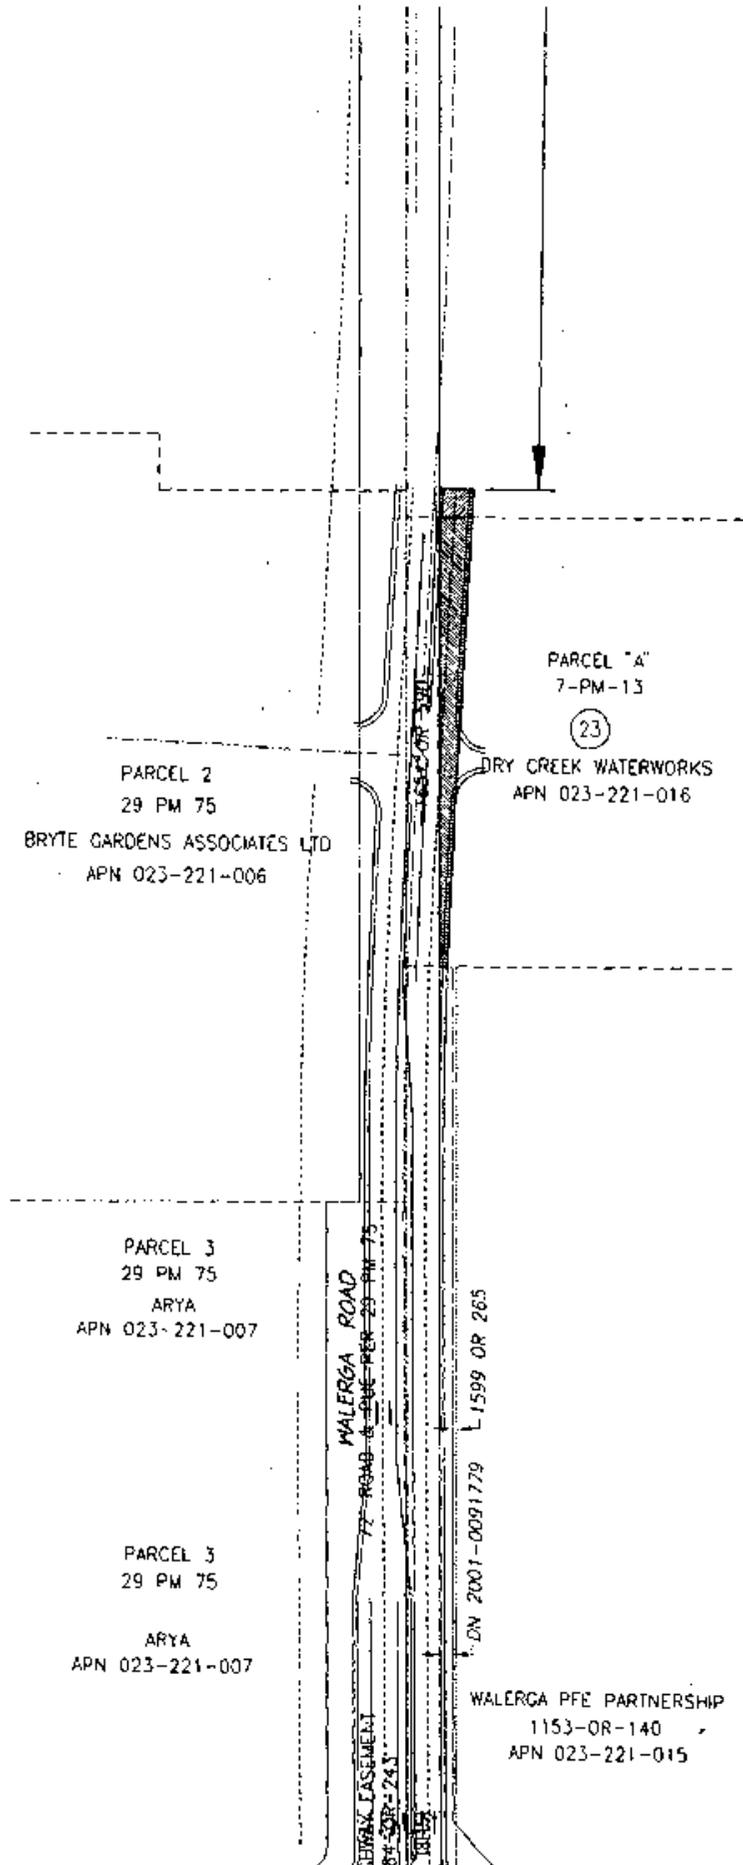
INTERSECTION IMPROVEMENTS
